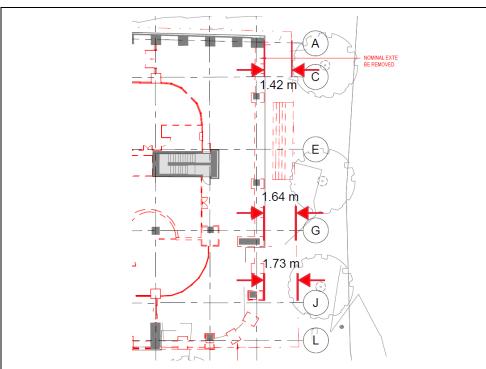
Proposed demolition plan showing current setbacks to St Kilda Road
